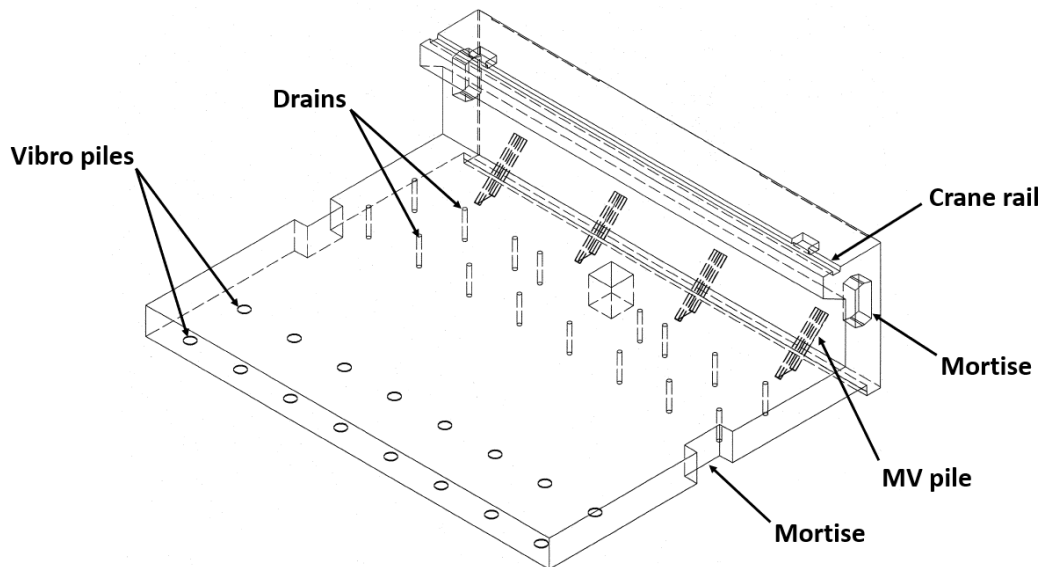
Isometric drawing of a section of the quay wall superstructure (Scheel, 2007)
